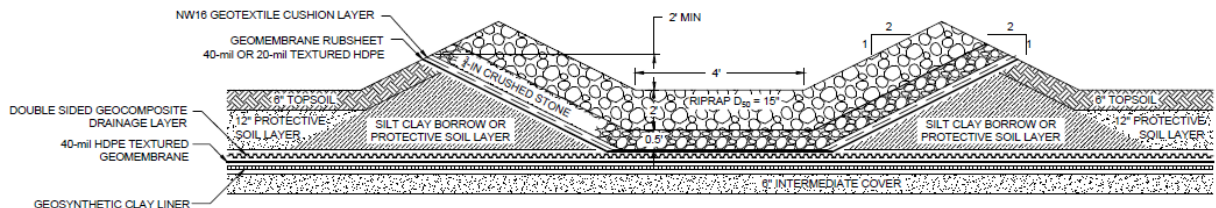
Typical Cover System Sideslope Drainage Bench Section
